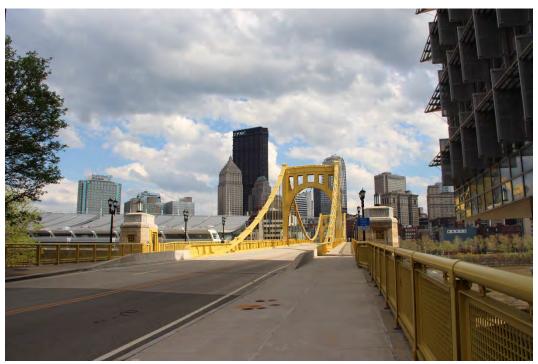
Rachel Carson Bridge (April 2024), view of east sidewalk, facing south from north end of bridge.
